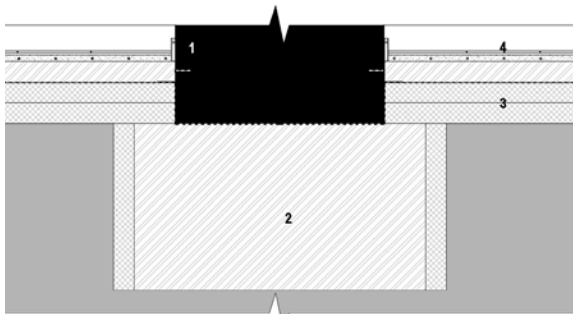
Footing detail. (1) poured earth; (2) concrete footing; (3) foam insulation; (4) tile flooring on top of self leveling compound with heating cable
